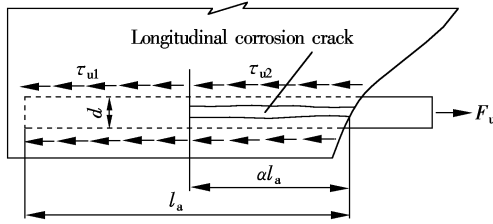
Scheme of longitudinal cover cracking due to corrosion in anchorage zone at supports for simple concrete beam
